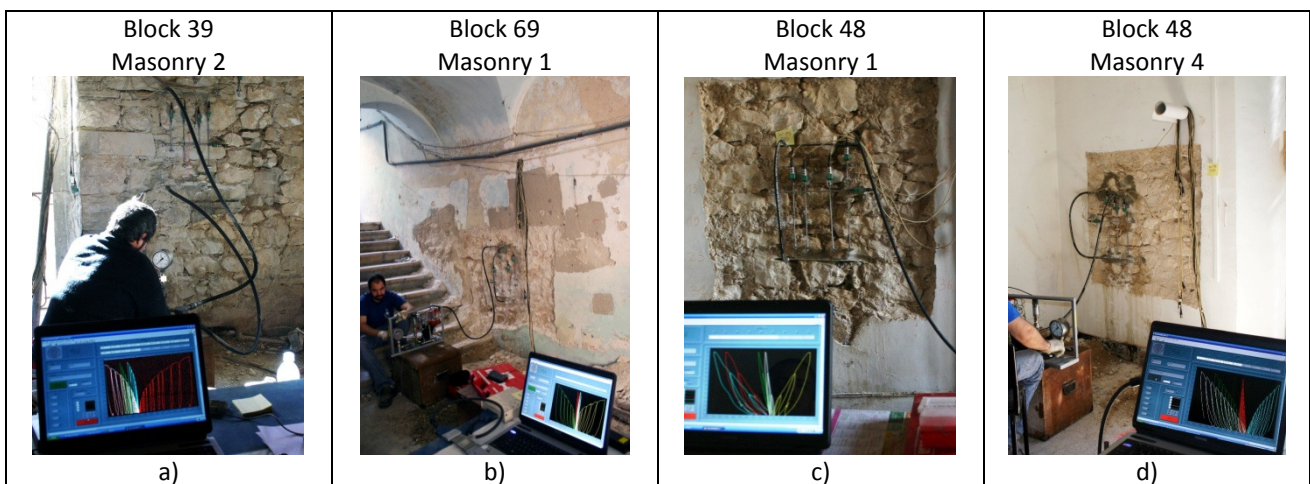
Double flat jack tests executed in: a) block 39 (civil building deted XIX century); b) block 69 (medieaval building); c) and d) block 48 (Sardi Palace) (pictures by the author).
